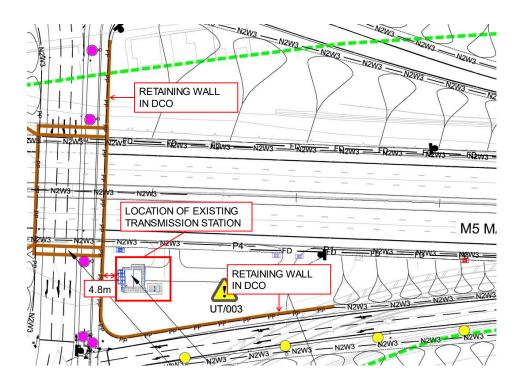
Existing TS location in Scheme design with dimensions for working room
